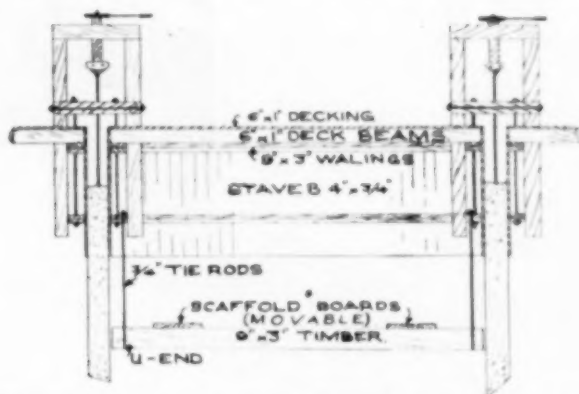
Details of Deck and Internal Hanging Scaffold.
